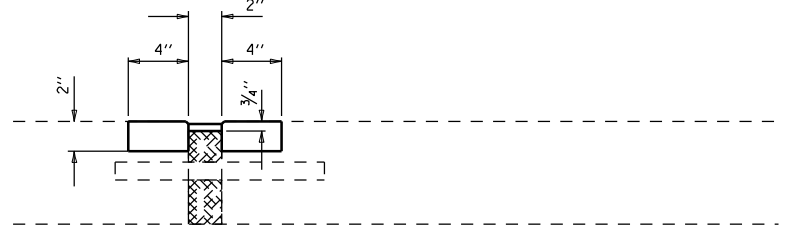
DETAIL OF CLASS SI CONCRETE (OUTLET) SPECIAL
